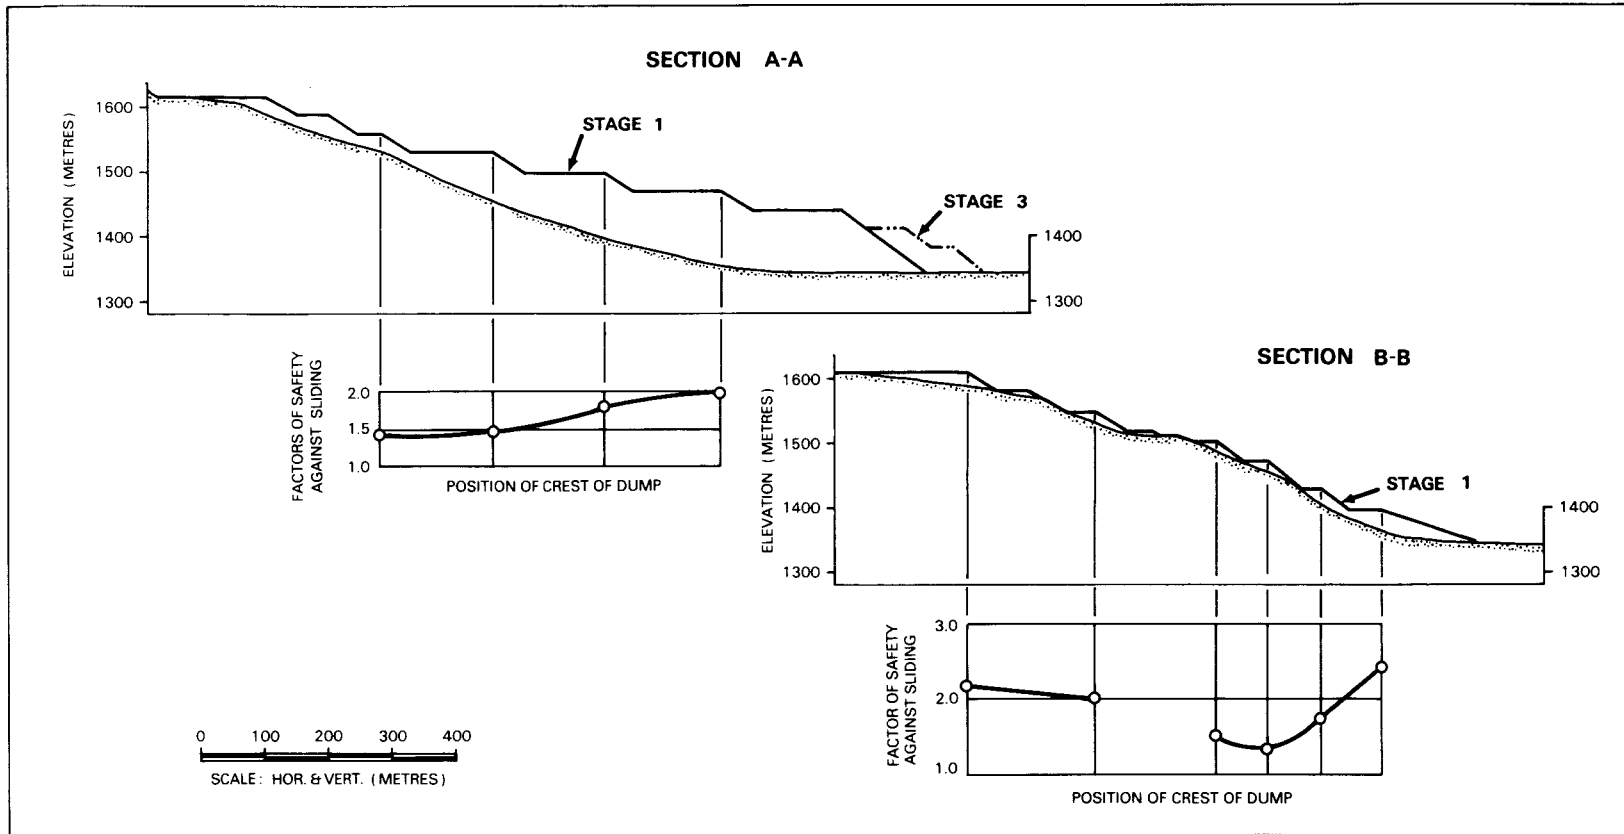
Cross-section profile of North Hill Waste Dump D (see Figure 15). Stage refers to the stage of the mine plan for the North Hill (see Subsection 2.1). (From Golder Associates 1981.)
